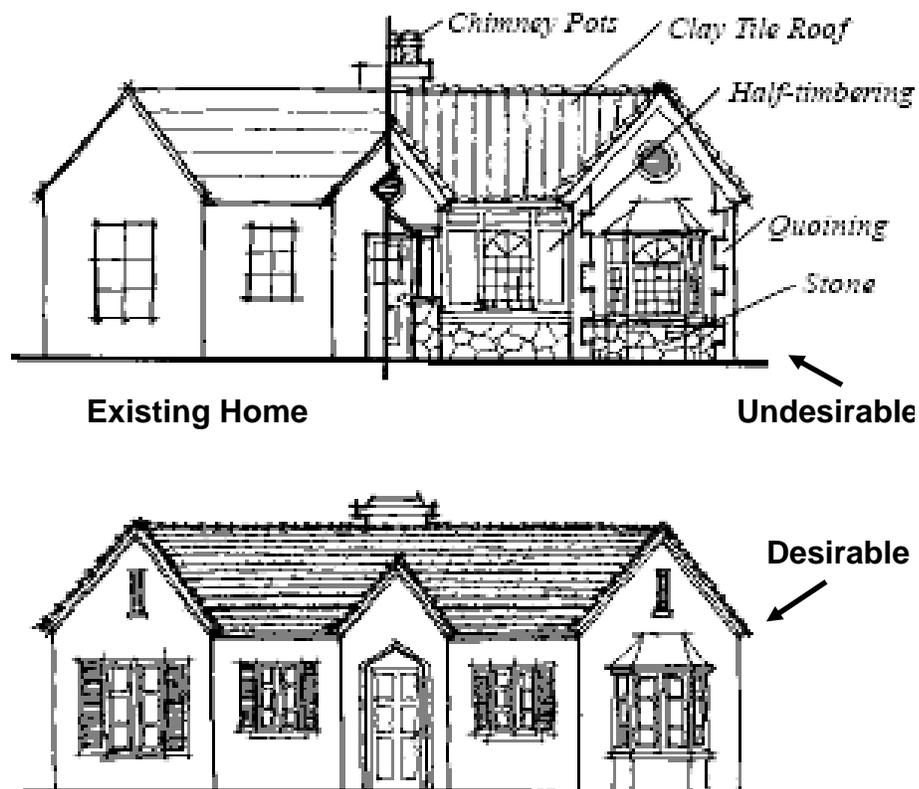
The existing home lacks architectural detail. The original redesign includes a confusing mixture of architectural styles and details, creating a chaotic presentation. The revised design, above, becomes more pleasing by including architectural features consistent with the French style of the home: bay window, shutters, and high-pitched front facing gable roofs.
